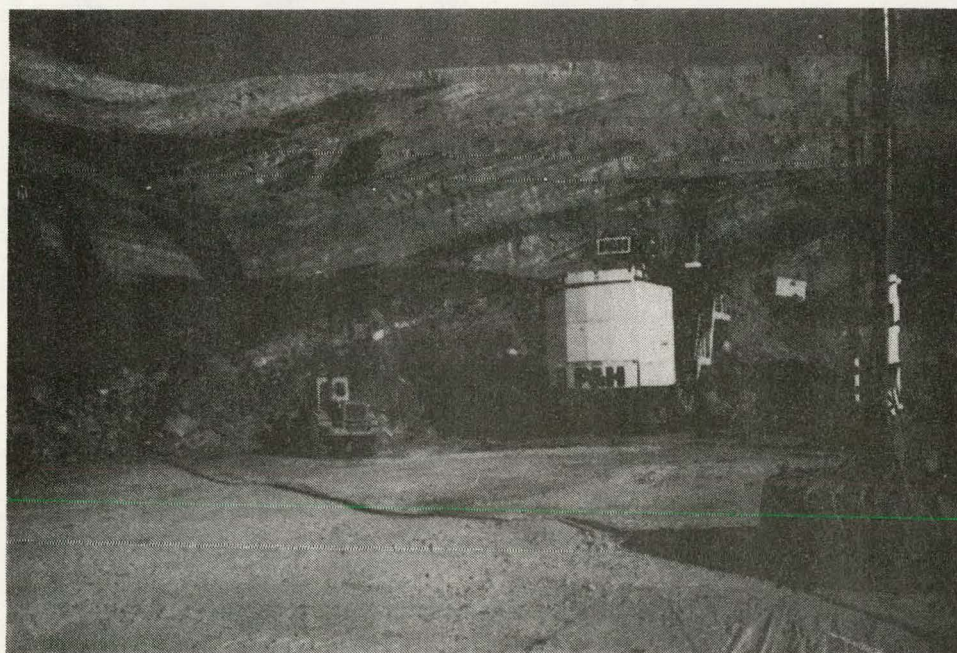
STRIPPING OVERBURDEN, LOOKING NORTHWEST FROM PIT FLOOR (POINT A, FIGURE 4)
